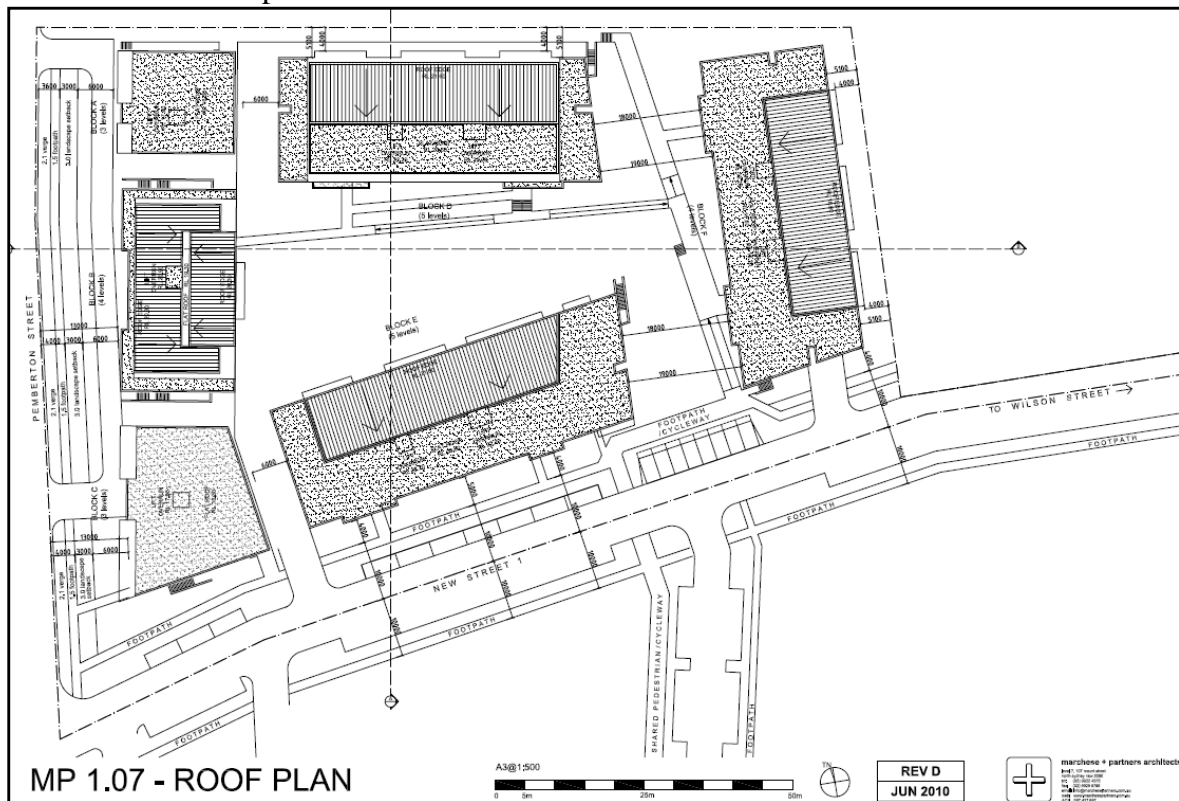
Roof Plan of Buildings A to F approved under DA10/313 and New Street 1 (to the south) – source Marchese + Partners Architects.
